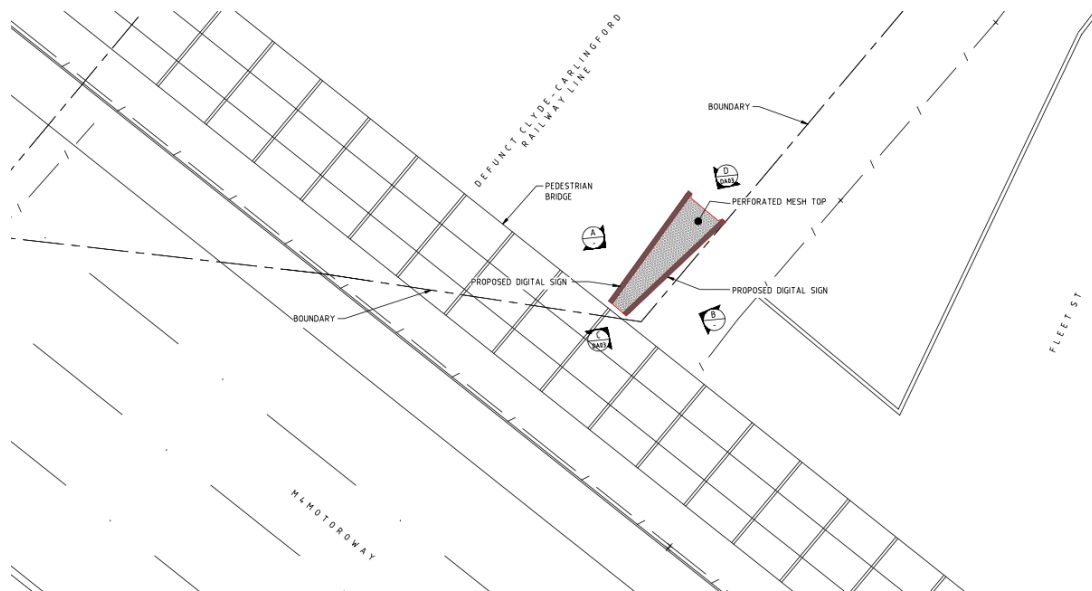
Proposed site plan (Source: Dennis Bunt Consulting Engineers)
